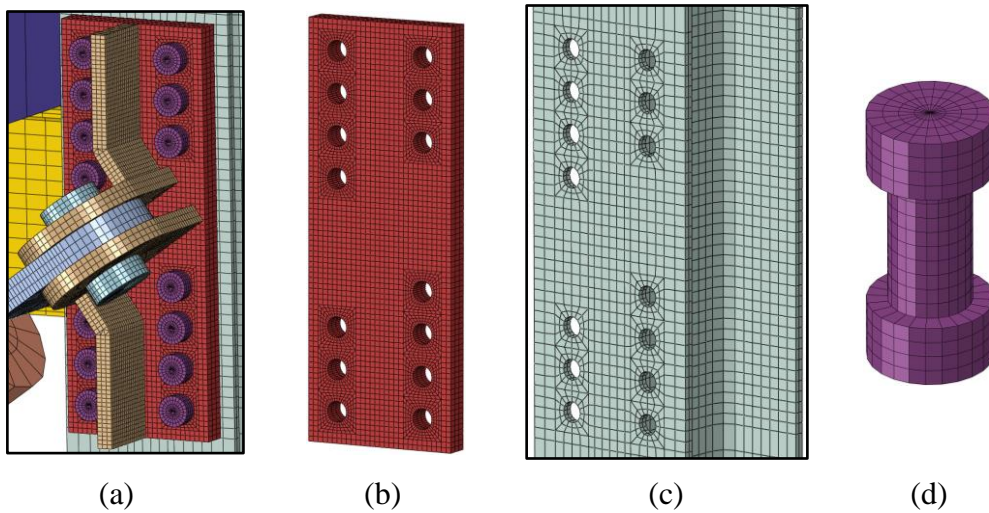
Mesh detail of BRB to Column Connection: (a) Connection, (b) Plate, (c) Column, (d) Bolt.
